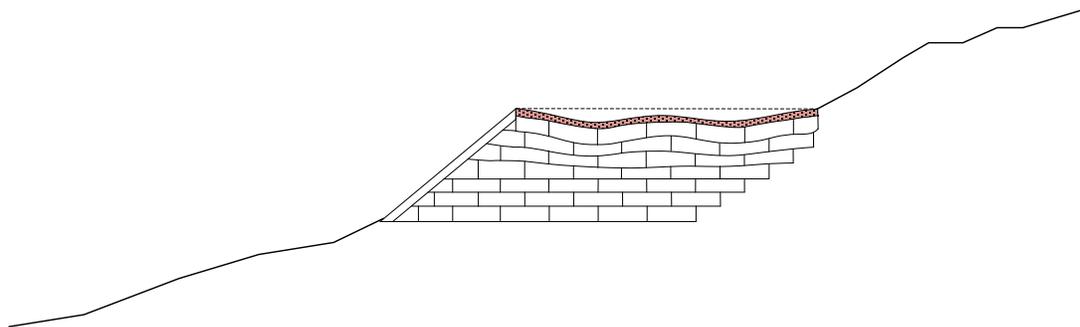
Load-bearing failure of the blocks involving excessive vertical deformation.
